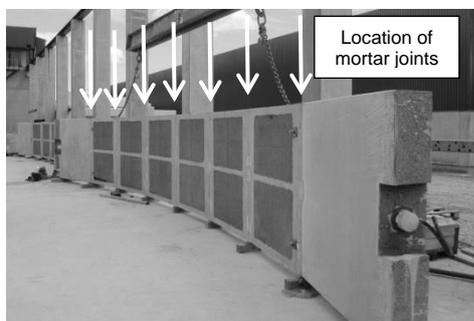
Collecting and post-tensioning several SL-Deck Elements to create an arch substructure. The mortar joints between the elements are 1.75 m high. The photo shows a test arch with a span length of 13 m.
